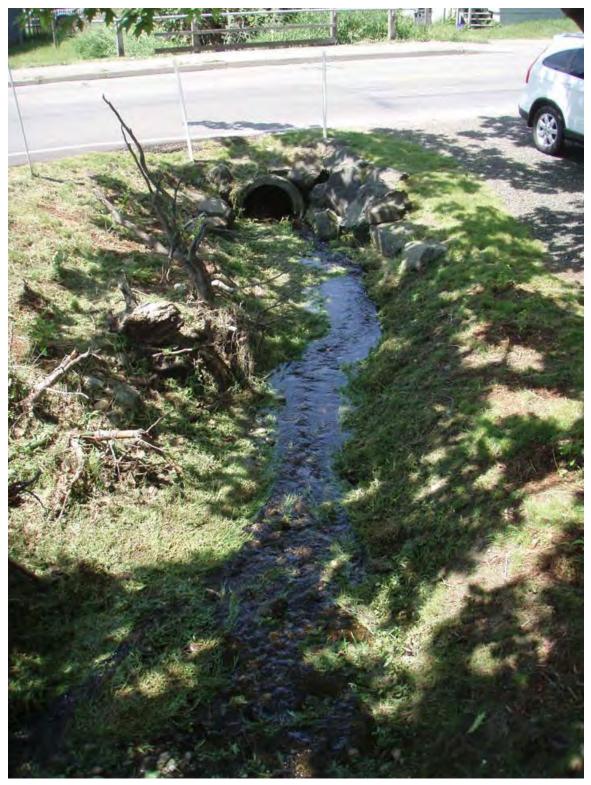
Undersized culvert at 8th Avenue NE, facing downstream
